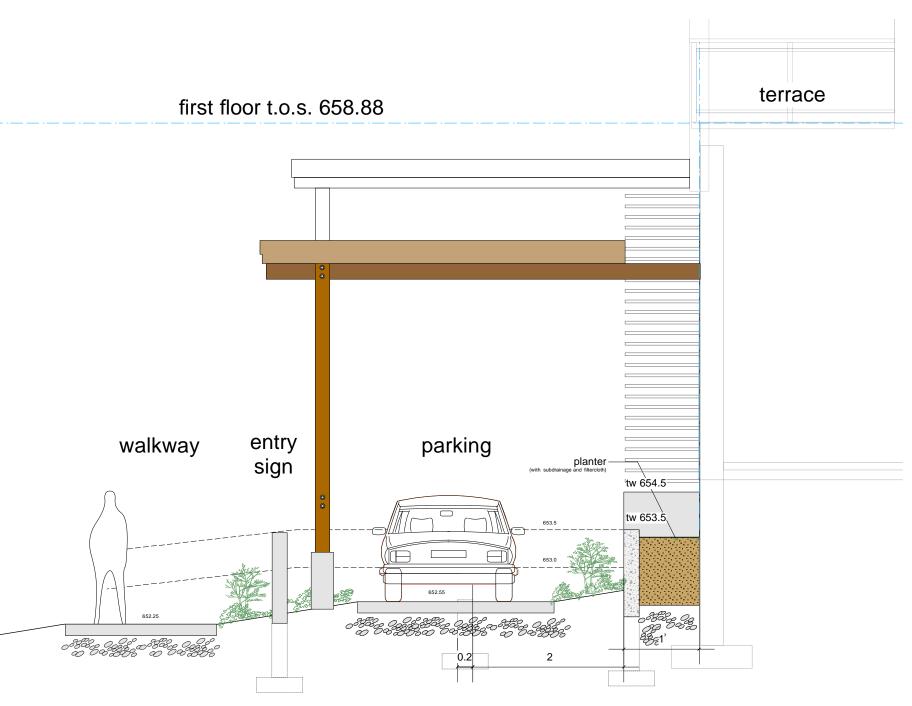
DETAIL ELEVATION A2: Canopy Structure Scale: 1:100
